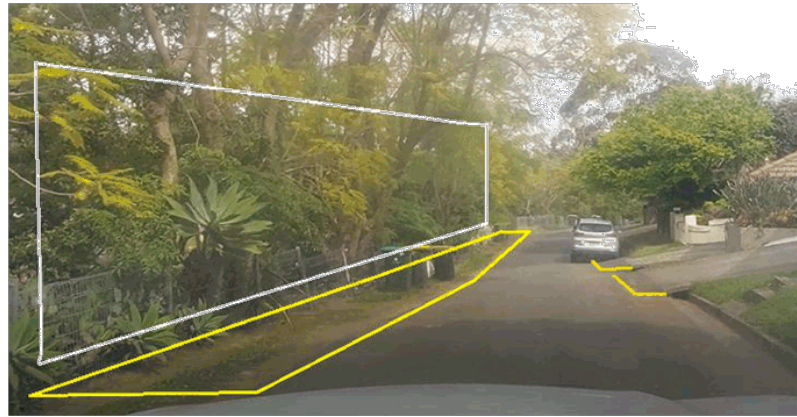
Chainage 220-246. The full-depth pavement widening works should continue on the left-hand side of the road. The bases of driveway ramps should be outlined with orange linemarking and the tree pruning works should continue along the left-hand side. Fence repairs should be implemented where needed.
